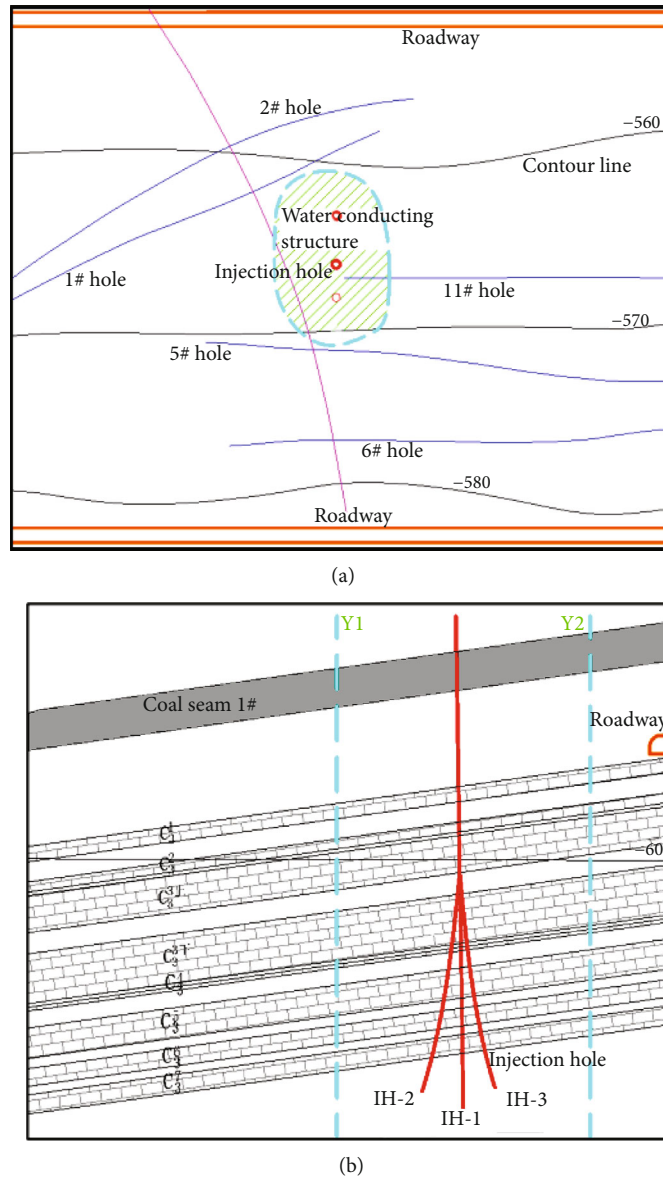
Grout holes in engineering. (a) Grouting plane diagram. (b) Grouting section diagram.
